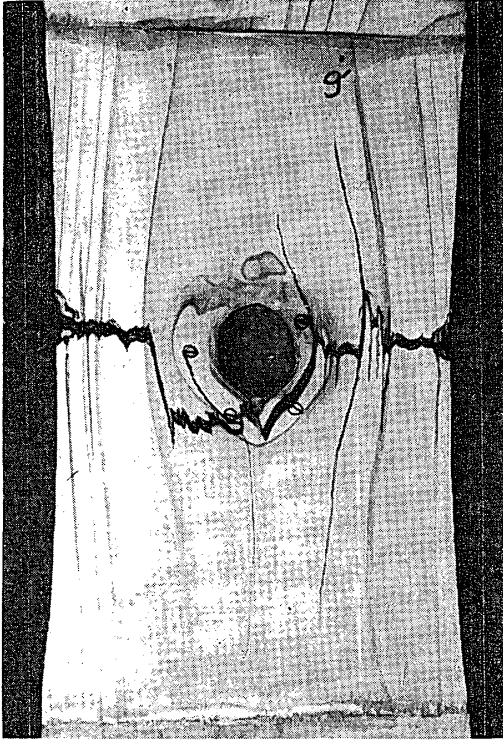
Pith side face of knotty specimen after failure test (Specimen No. 9).
